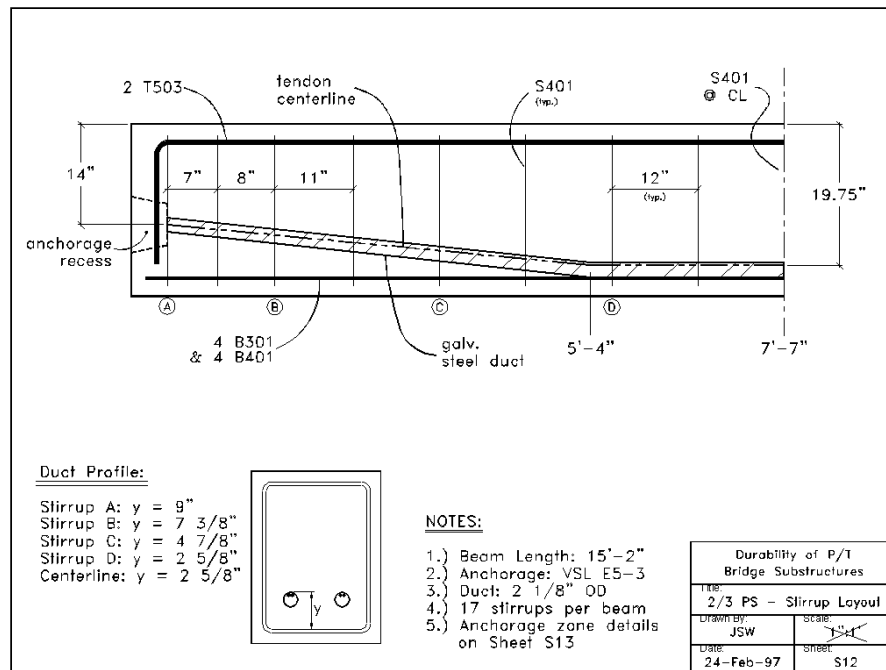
Sheet S12: 2/3 PS Stirrup Layout^{4.2}
